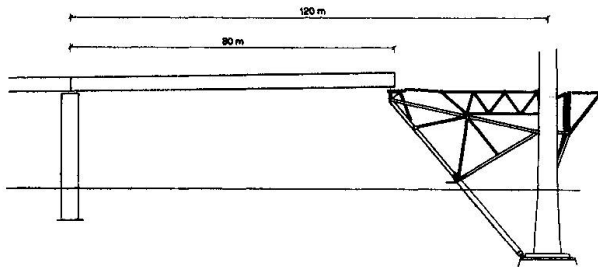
A steel bracket was a support point for a 80 m section.
